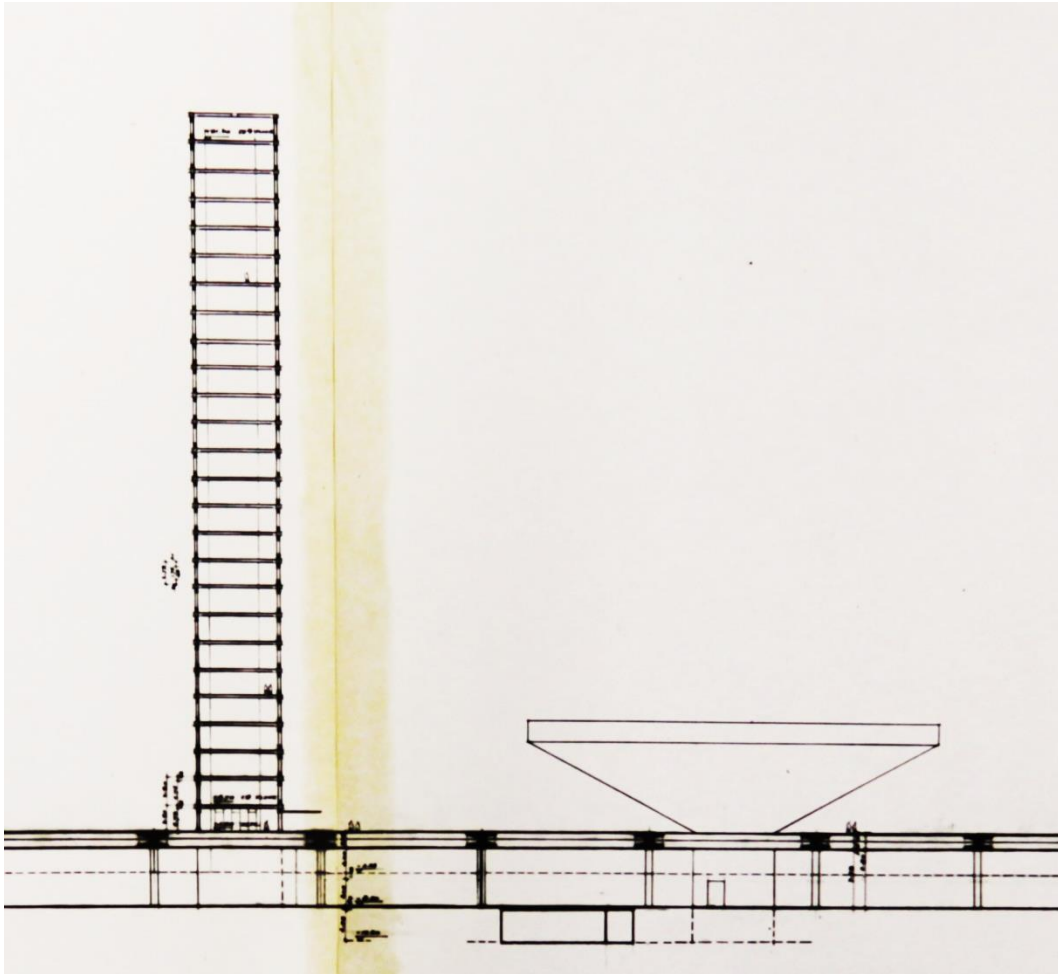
The 1966 booklet, a detail view of a general section of the main university building showing a cross section through the tower (Anonymous 1966)
